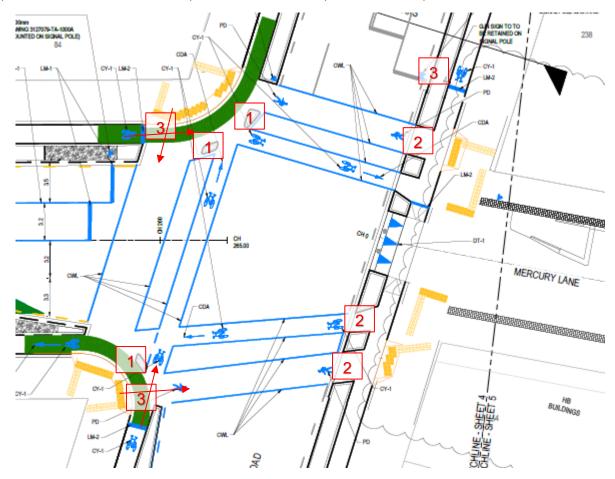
Proposed arrangement at Karangahape Road / Pitt Street
